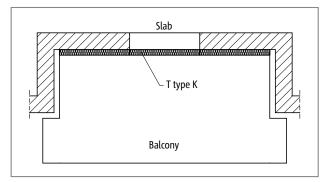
Schöck Isokorb® T type K: Balcony with facade recess
